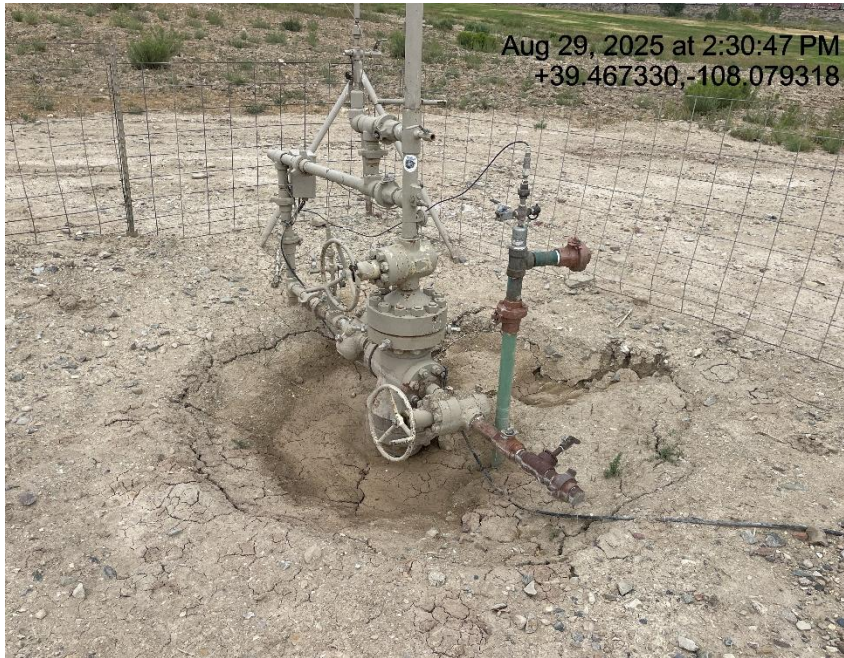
Subsidence starting to form around GM 22-2 wellhead
